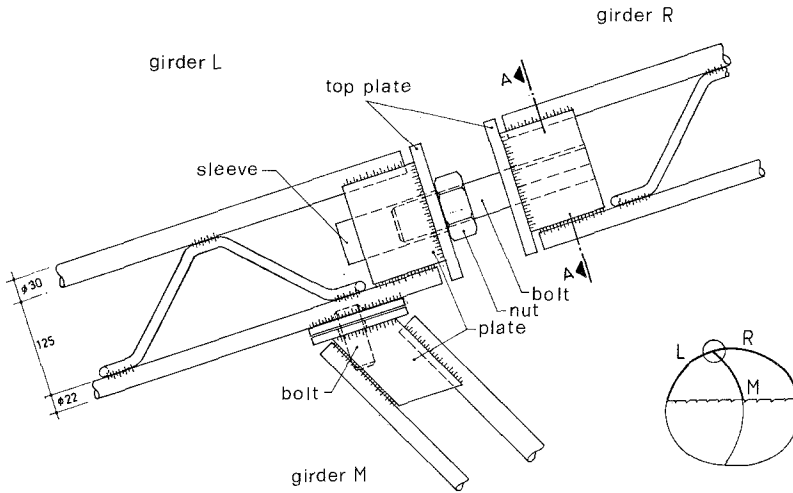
Construction of the joint in the roof for a two track underground tube with partial face excavation
